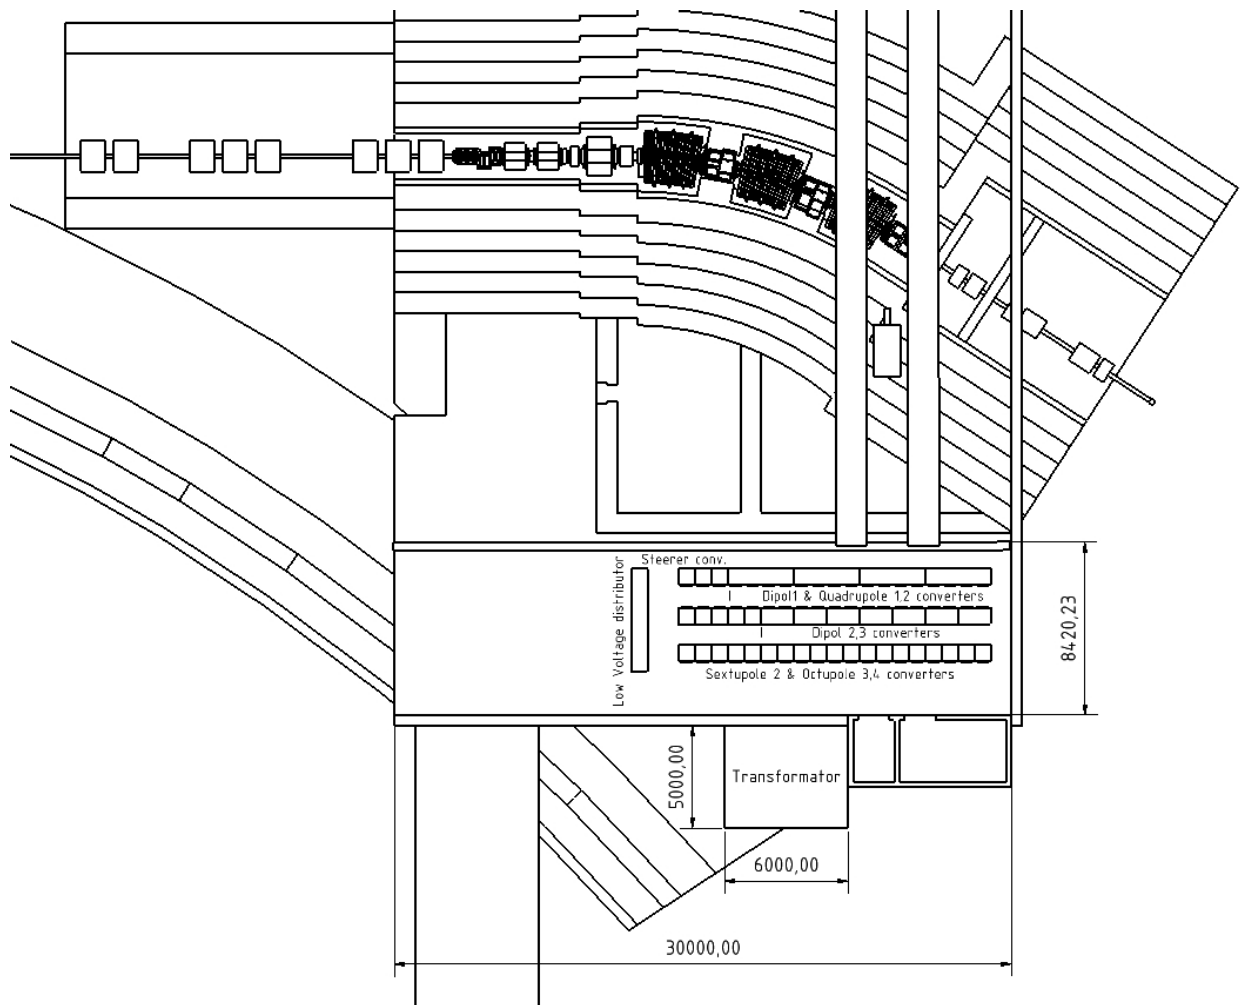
Planned arrangement of power supplies in Target-Building (building #18), level 1.
